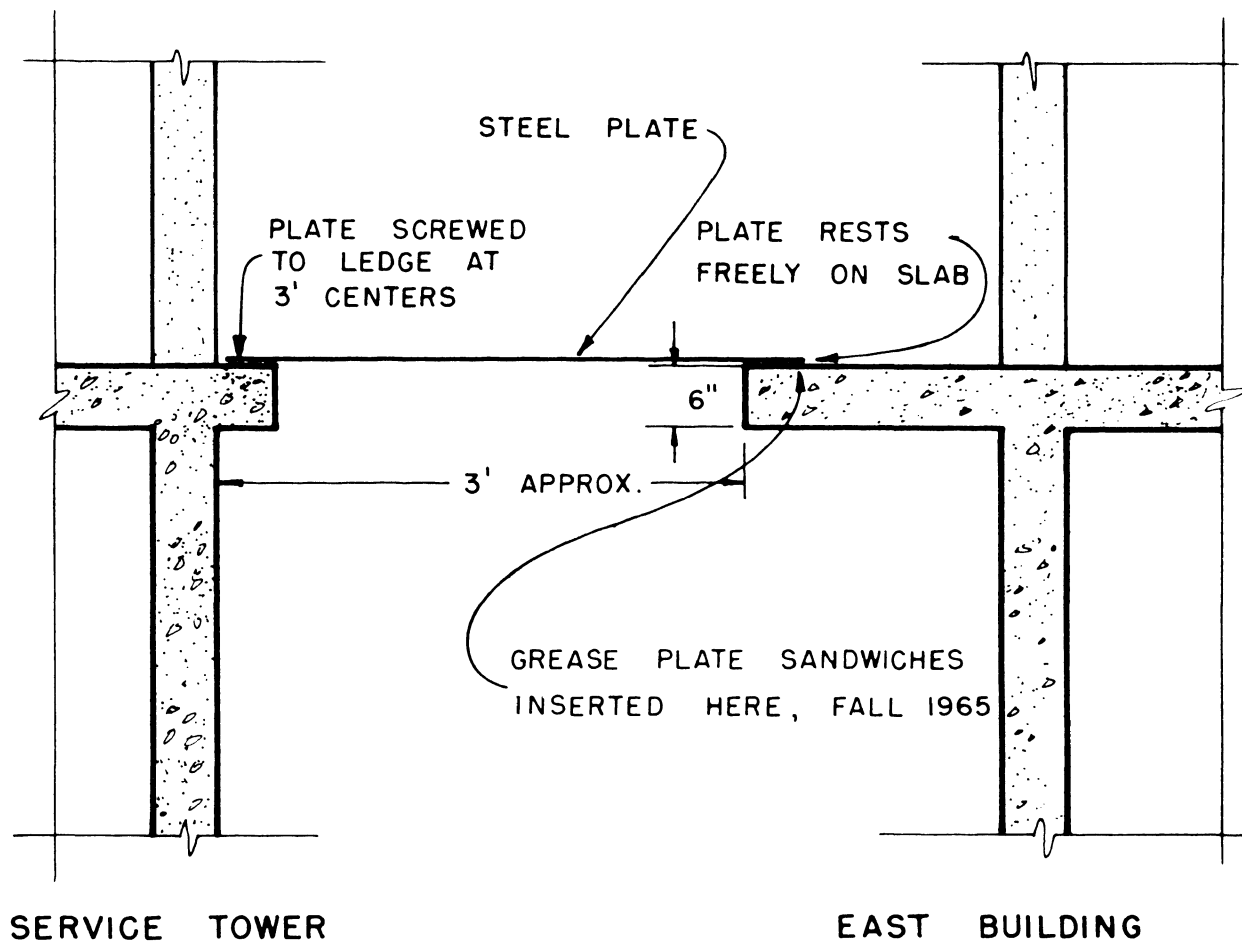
CONNECTION BETWEEN BUILDINGS AT ENTRANCE FROM
